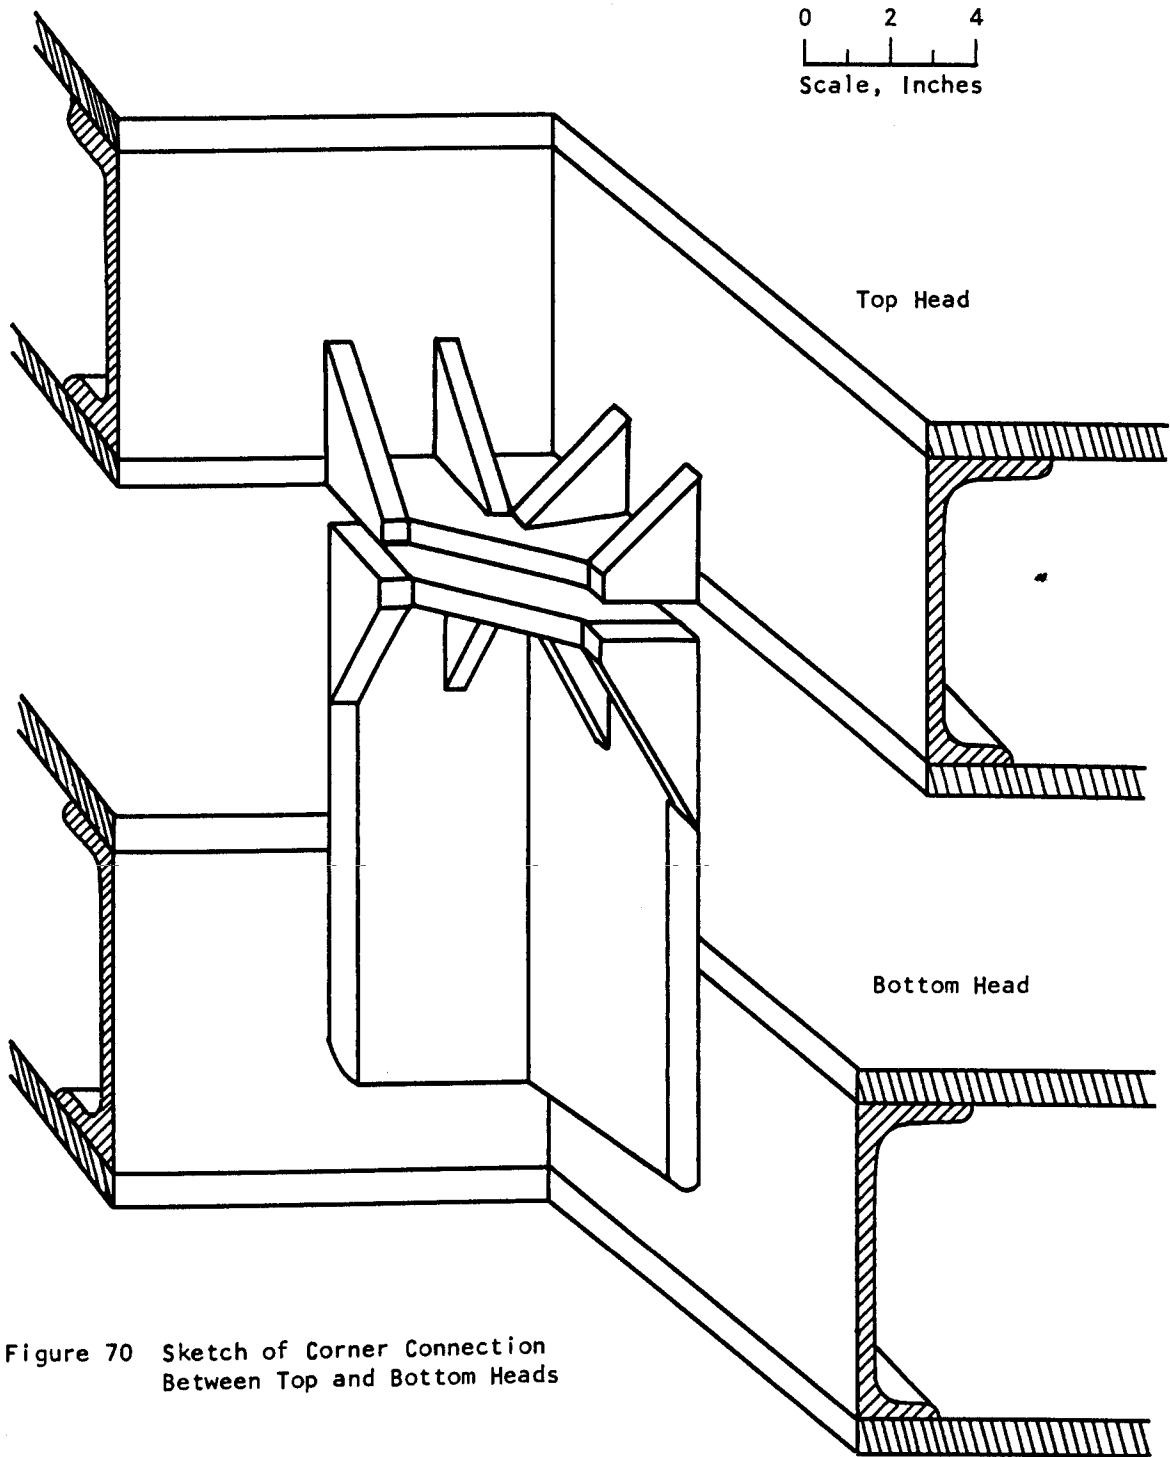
Sketch of Corner Connection Between Top and Bottom Heads
